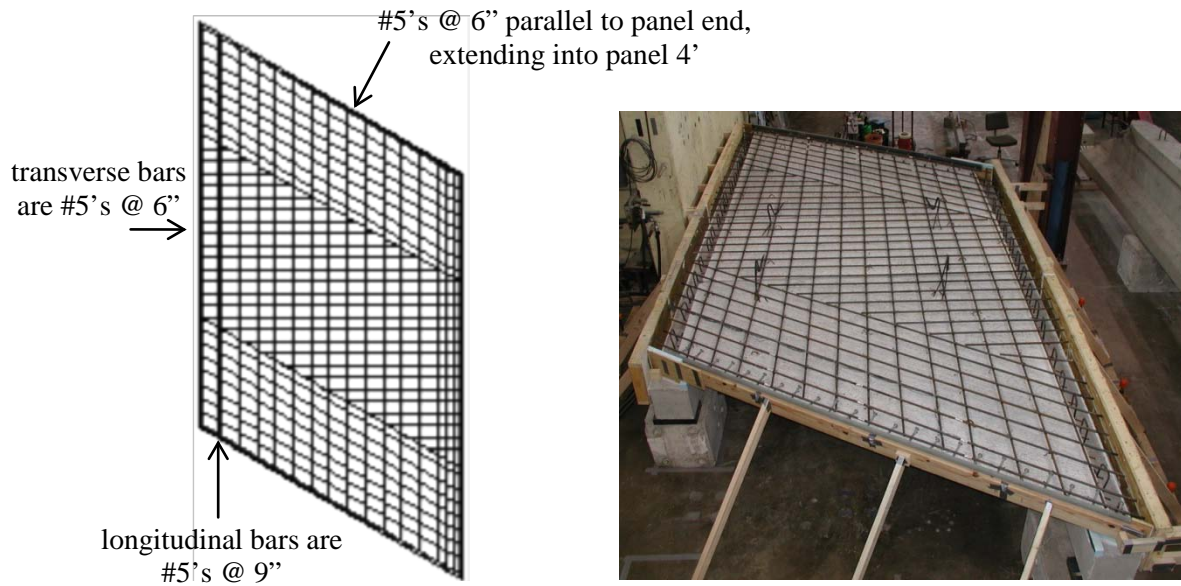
Cast-in-Place Topping Reinforcement for Specimen P30P3
